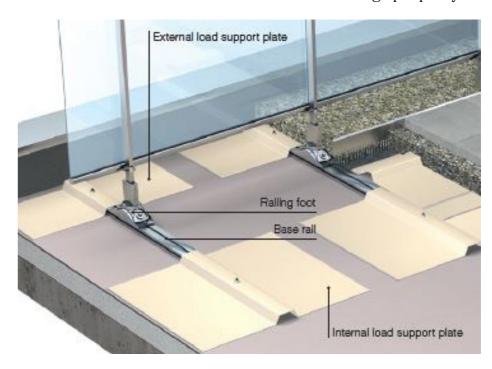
J Example base detail for self-supporting balustrade detail. N.b. Proposed balustrade will be a bespoke system with traditional iron railings.
